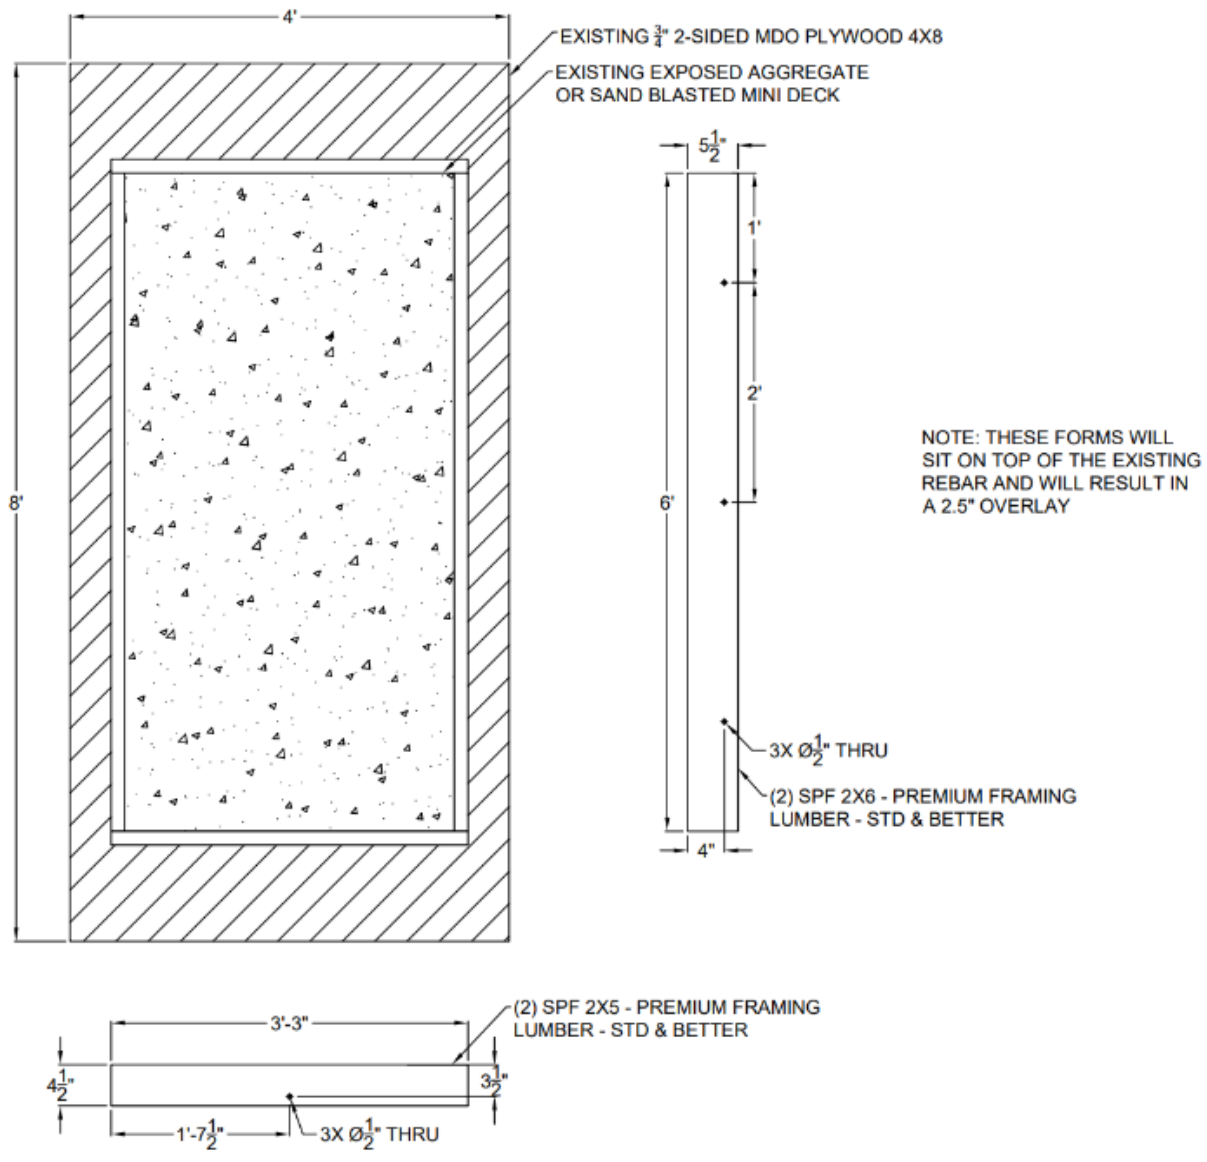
Overlay formwork drawings and dimensions for the decks without exposed rebar
